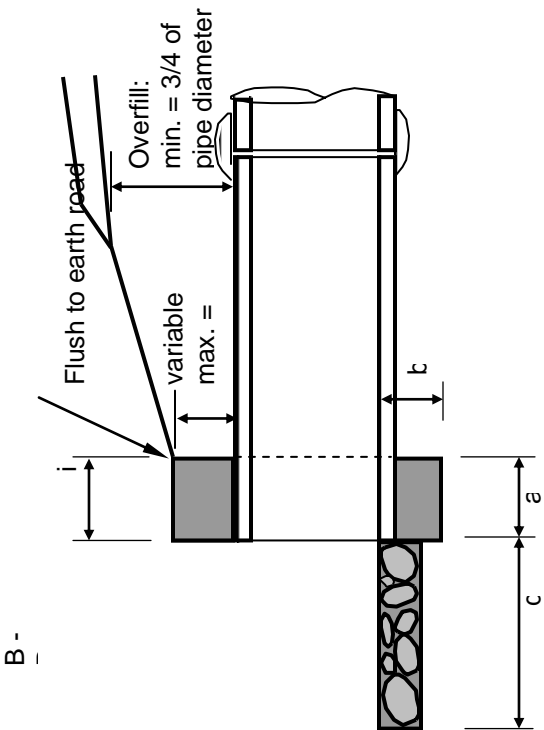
HEADWALL TYPE 3A (CONCRETE BLOCK HEADWALLS)
